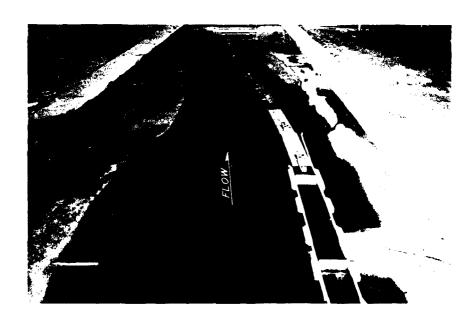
Plan A, looking downstream, discharge 100,000 cfs. Path of downbound tow leaving replacement lock
